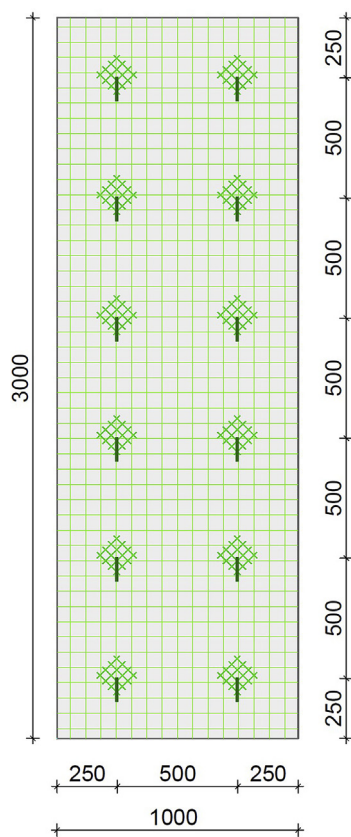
Main geometrical characteristics of the tested specimens with positioning of the connections in reinforced samples.
